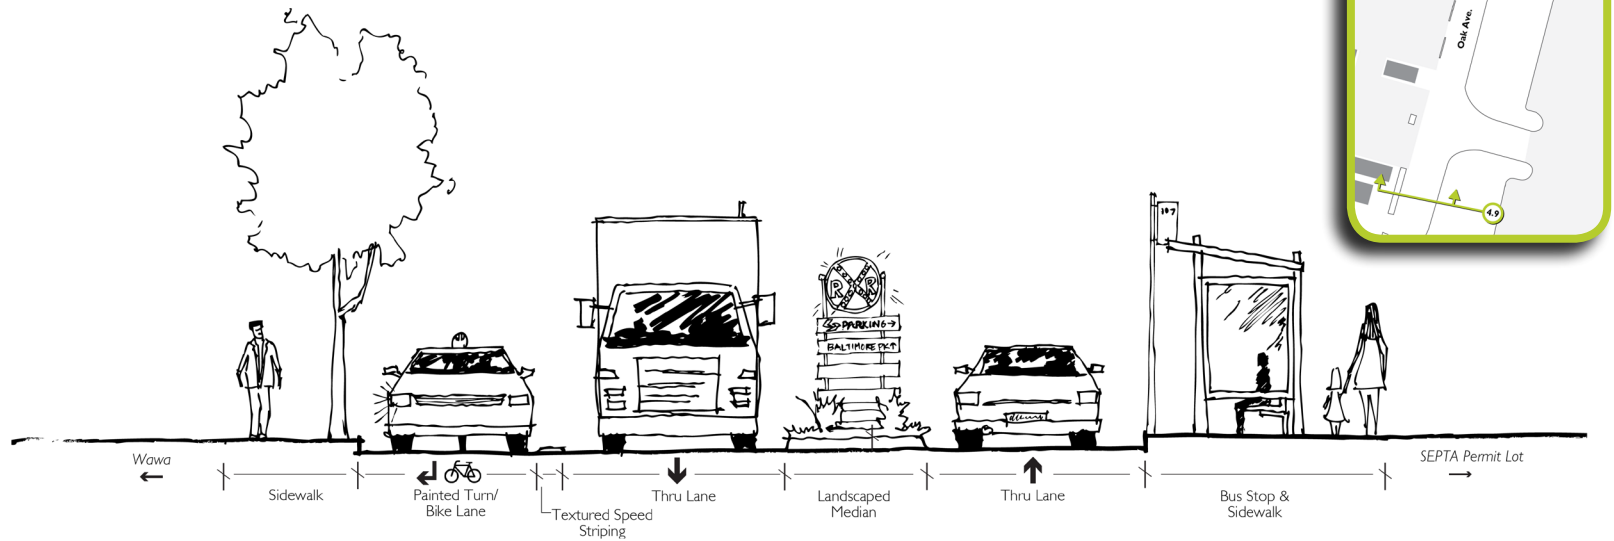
| Oak Avenue Streetscape Recommendations, Part 1
